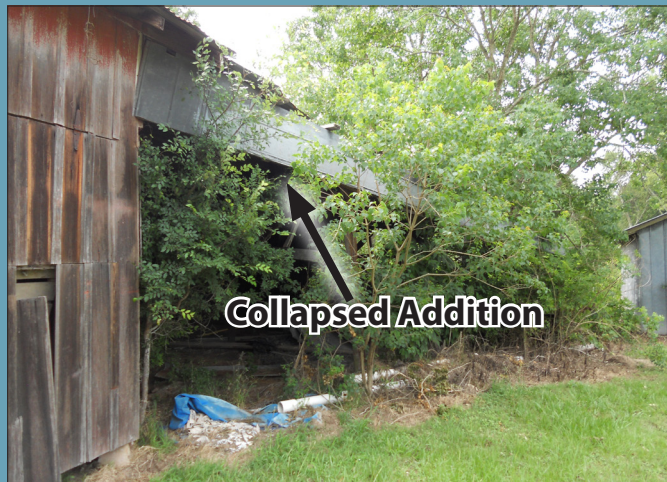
Collapsed addition. Remove if possible, to stop drag on main building.
